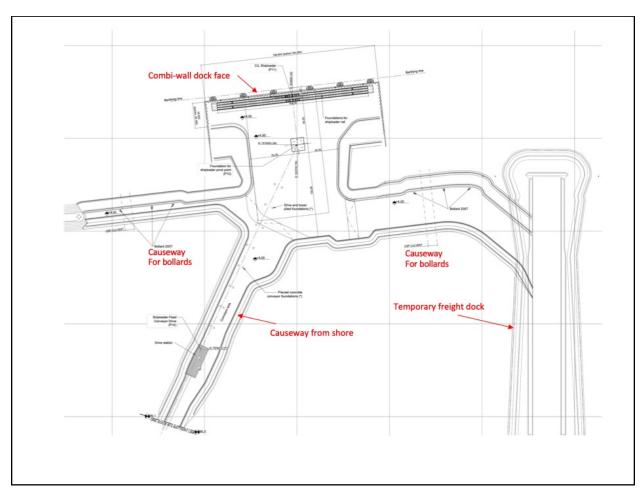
Drawing – plan view (current design total dock width is 188.7m (end piles CL – CL)
